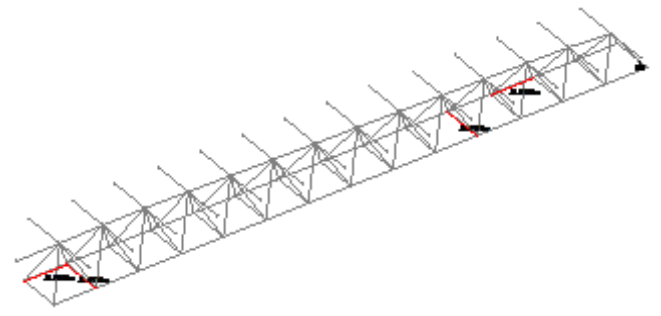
Elevation View of Optimized Space Frame Showing Slope
